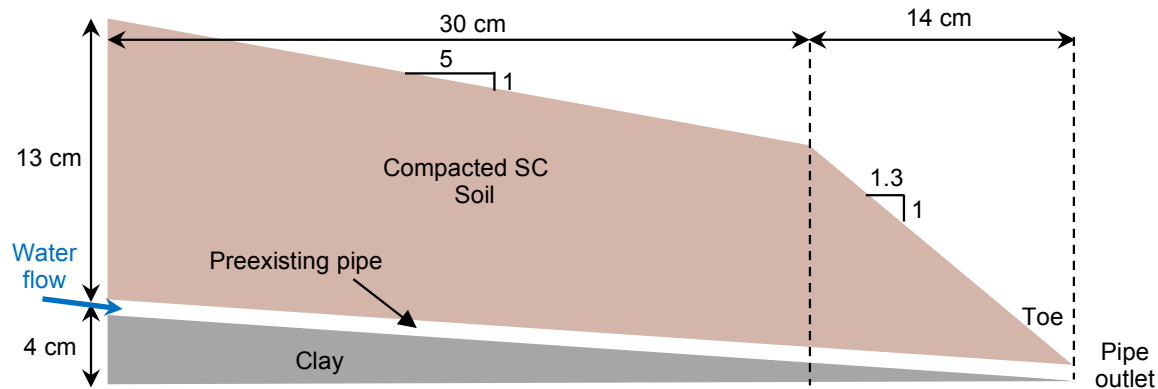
Cross-section of the model slope showing the two soil layers and the location of pre-existing 5 mm pipe that was created during construction.
